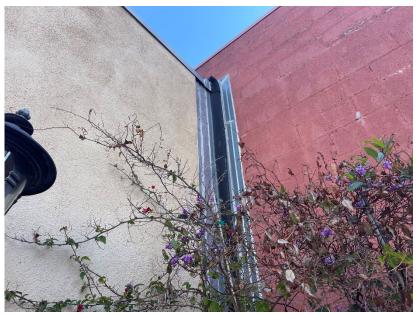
Vertical seismic joint at east side of building, viewed from fifth floor balcony. Looking northeast. (Photo taken by P&T 03/14/2025)
